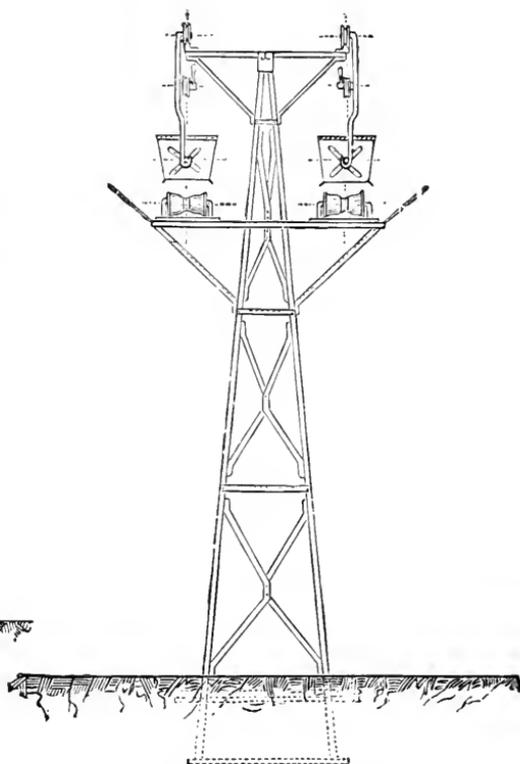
OTTO AERIAL ROPEWAY, IRON STANDARD.
